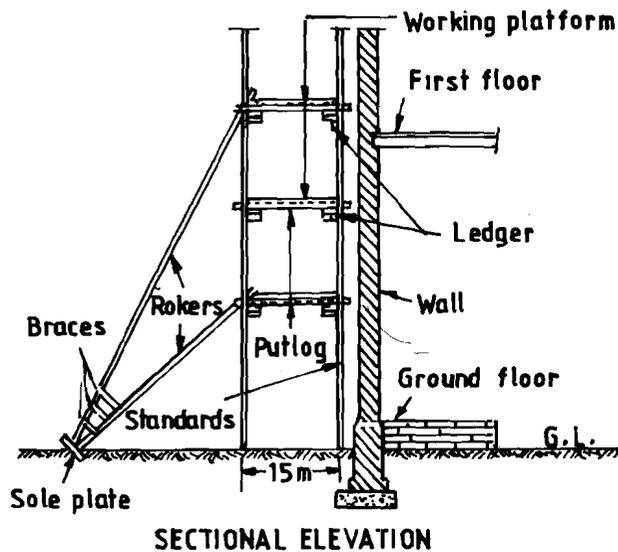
Details of Double or Mason's Scaffolding with Raking Shore
